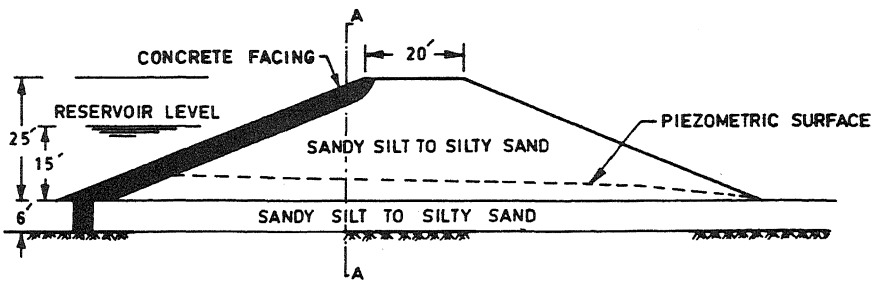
CROSS SECTION THROUGH EMBANKMENT
